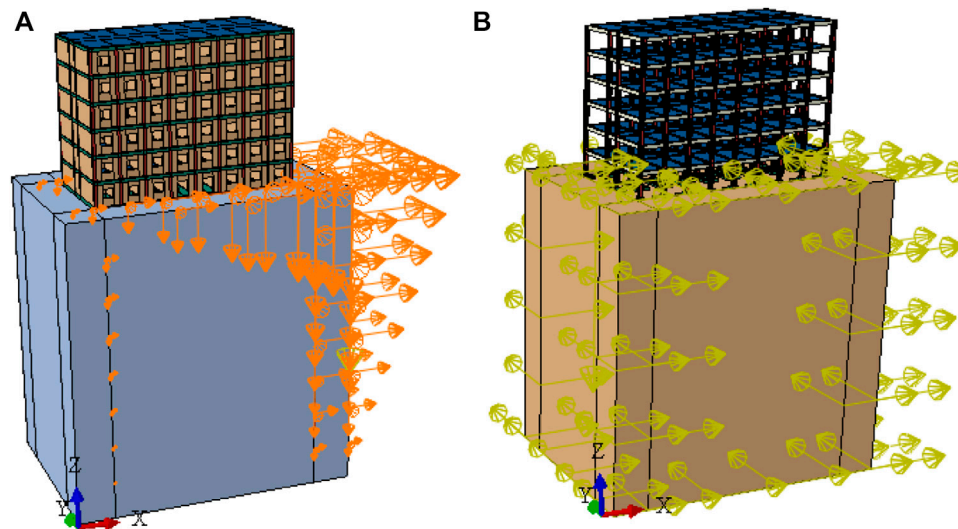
| Calculation model and load distribution: (A) ground deformation load applied to buildings; (B) buildings subjected to mine seismic loads.
